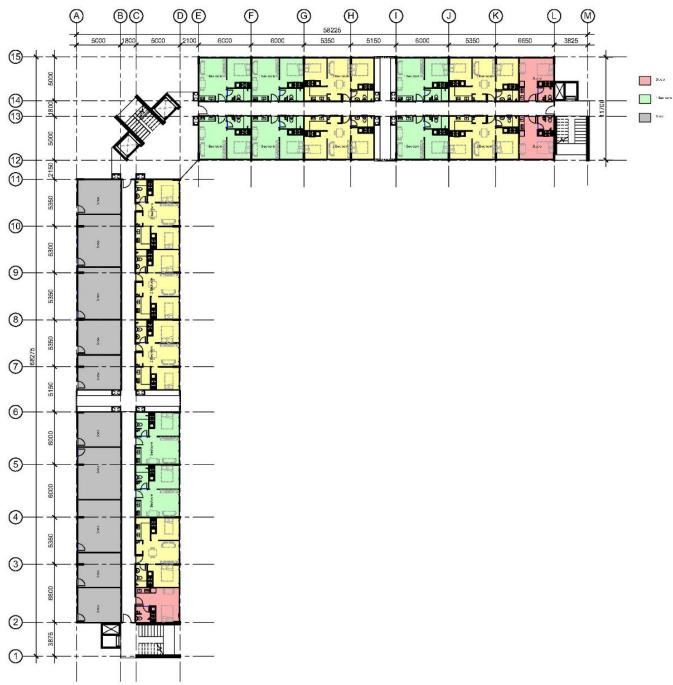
L-Shaped Typical Ground Floor Plan with Retail Units
